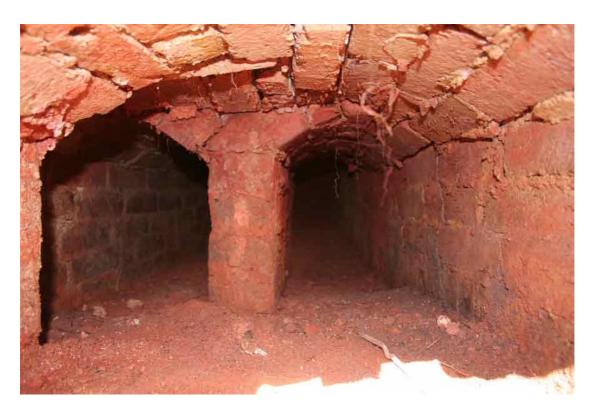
Trench 2C. Detail of flue structure beneath coke oven
